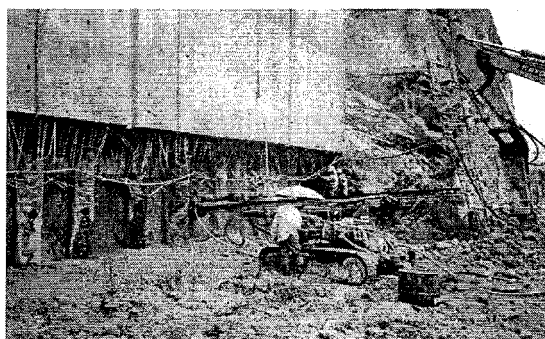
Drilling of Tie Back Anchors Through Bored Piles Prior to Placing Reinforced Concrete Facing
